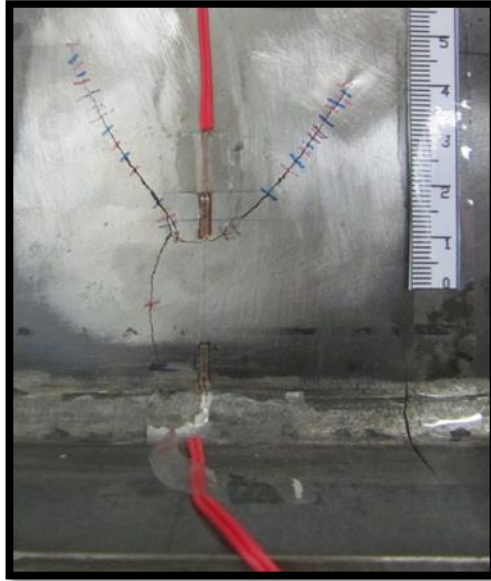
Specimen failures with new crack occurring outside the weak zone.
